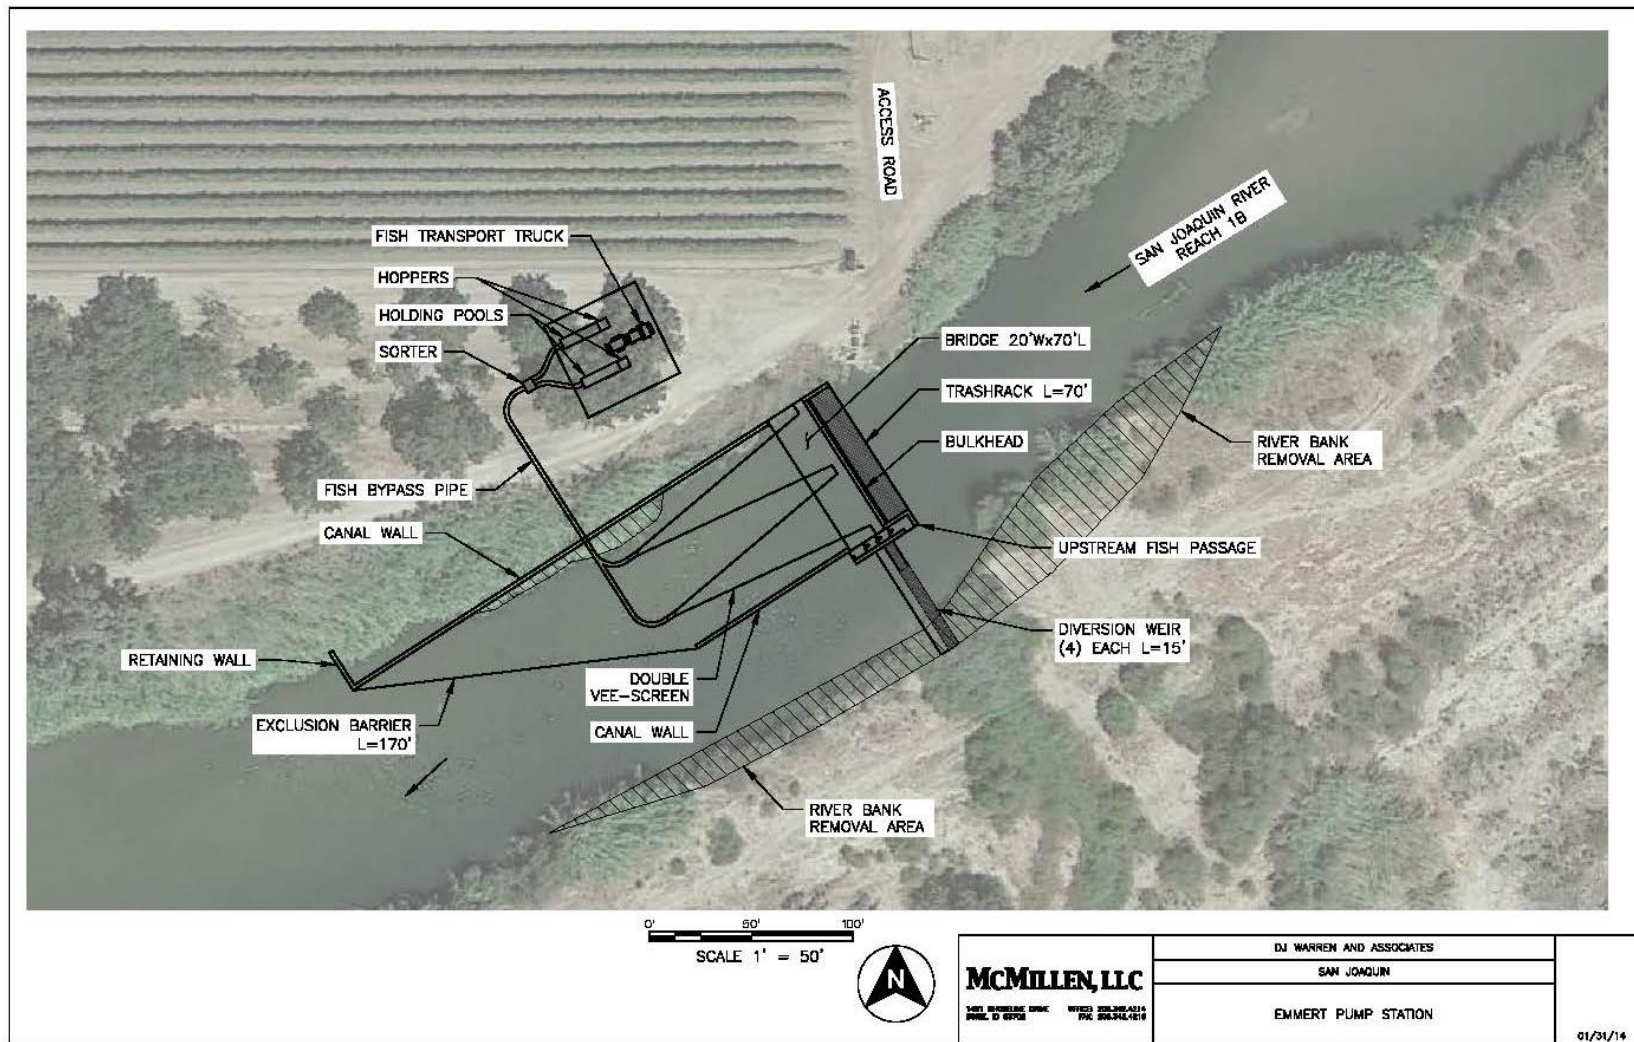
Alternative B: Conceptual design of Emmert Pump Station fish collection facility
